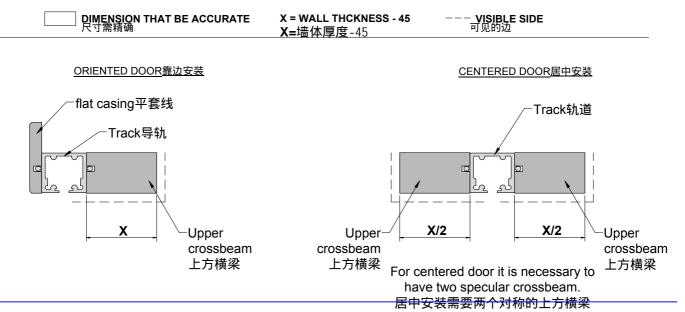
DETAILS FOR UPPER CROSSBEAM横向门套加工图
